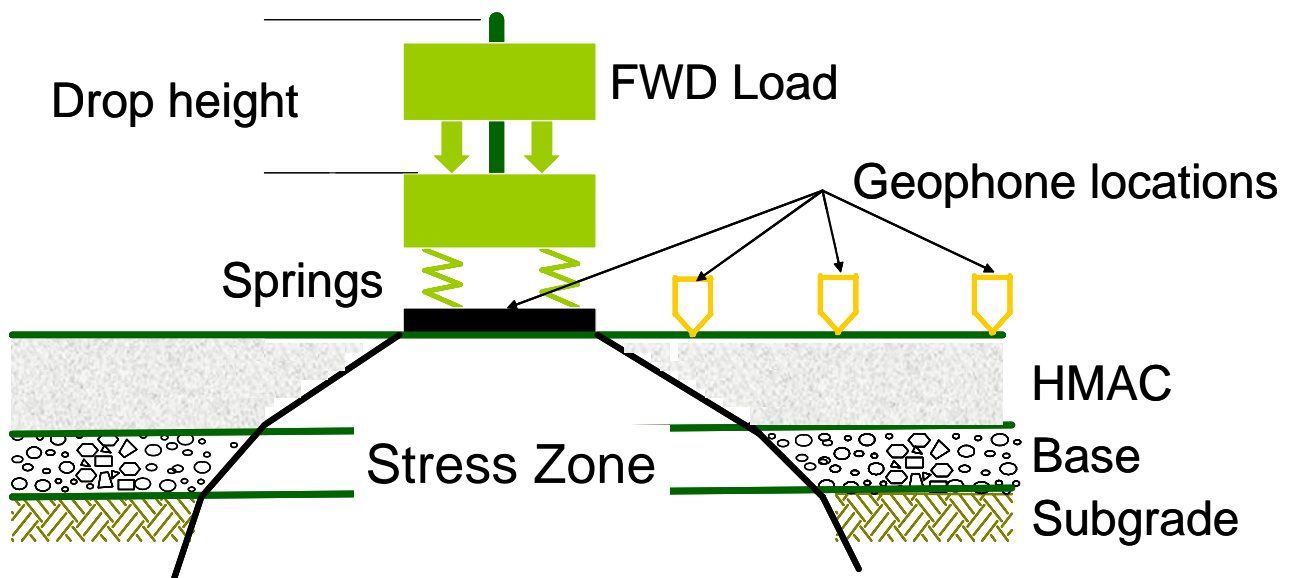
Schematic of the stress zone with a pavement under FWD testing.
